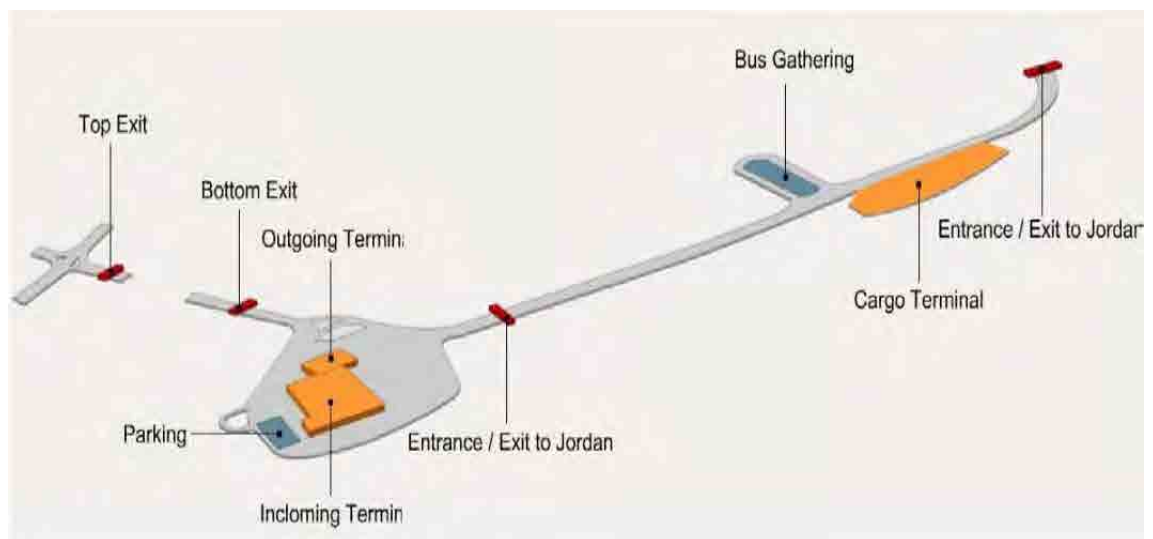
Schematic Plan of Cross Border Facilities at KHB (Palestinian Side)
